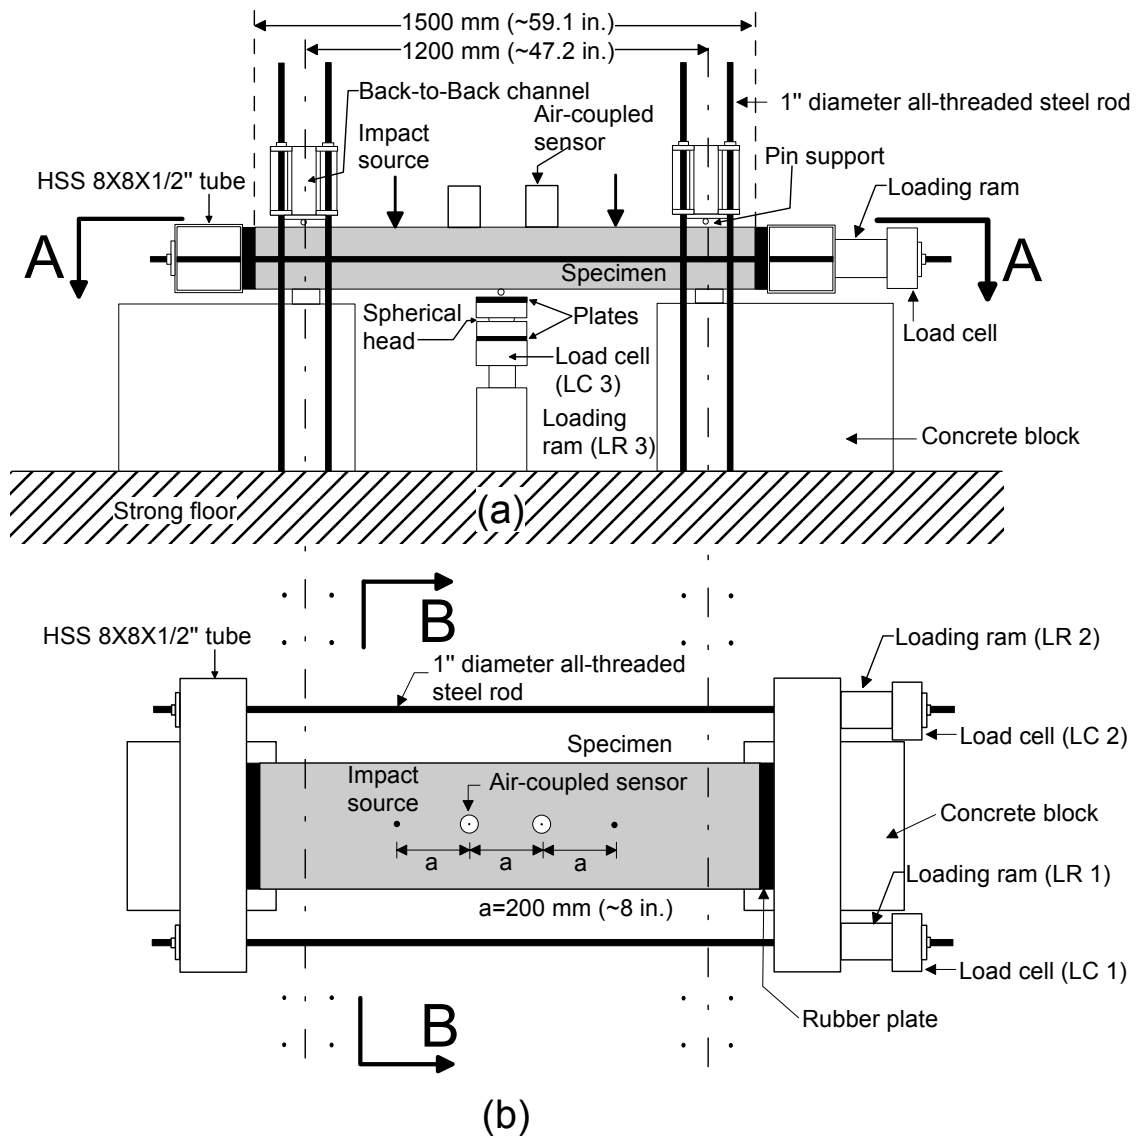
Test setup of the concrete specimen to apply compressive forces and generate a surface-breaking crack: (a) elevation view, and (b) plan view from the section A-A in (a).
